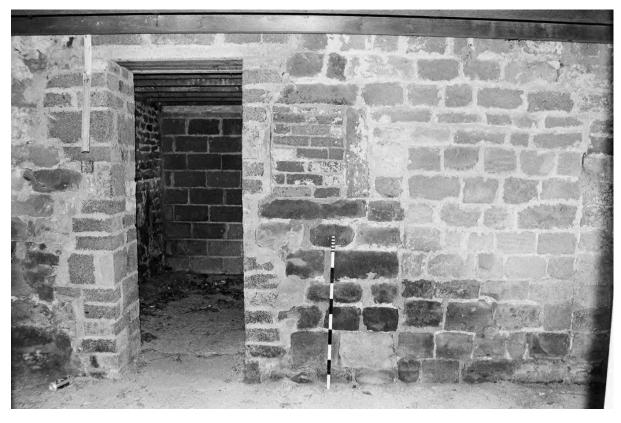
Farm Building 5: Room 5.4 Blocked Window & Door (Film 7/5). Facing West.
